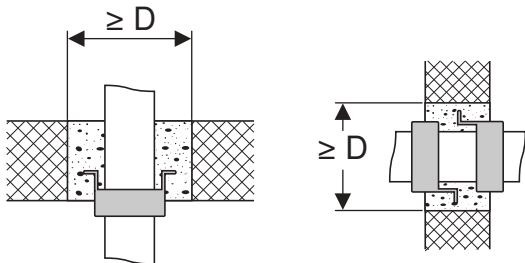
Minimum gap size D for the installation of a Geberit fire protection sleeve RS90 Plus EN in solid walls or ceilings
